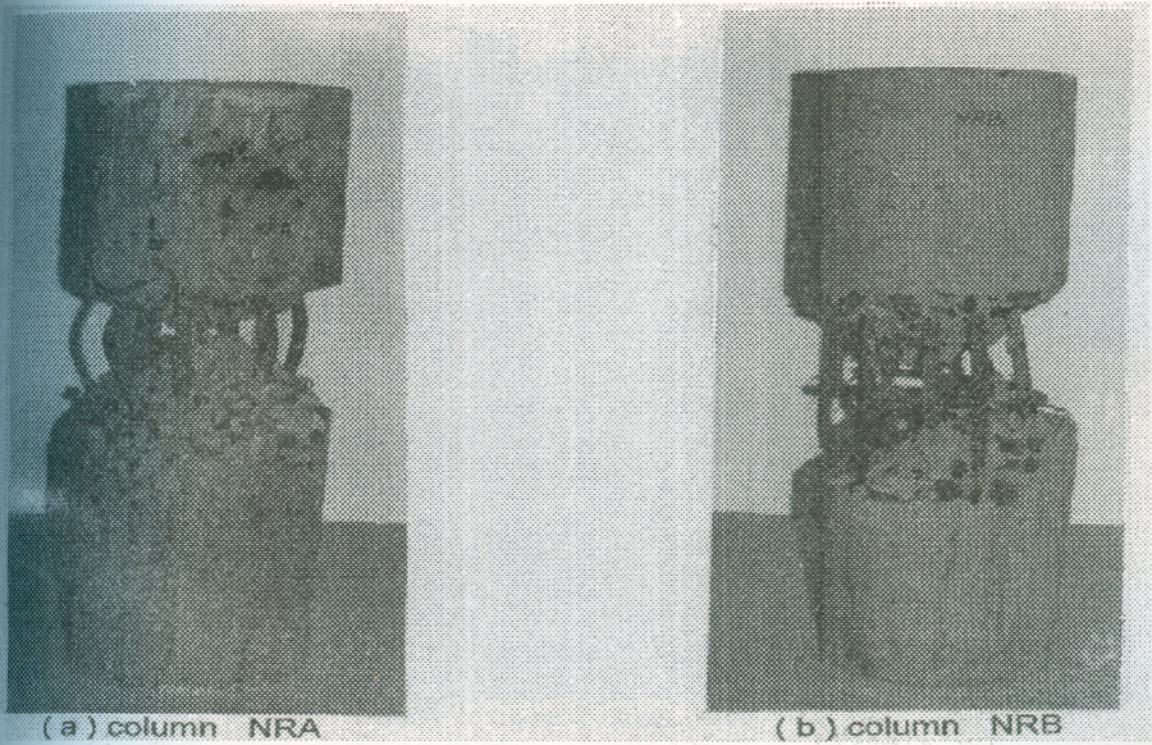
Failure of reinforced concrete columns, NRA and NRB
